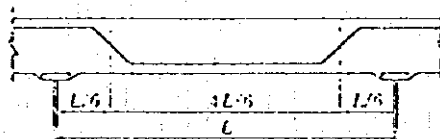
Position of bent of main reinforcement for continuous slab
